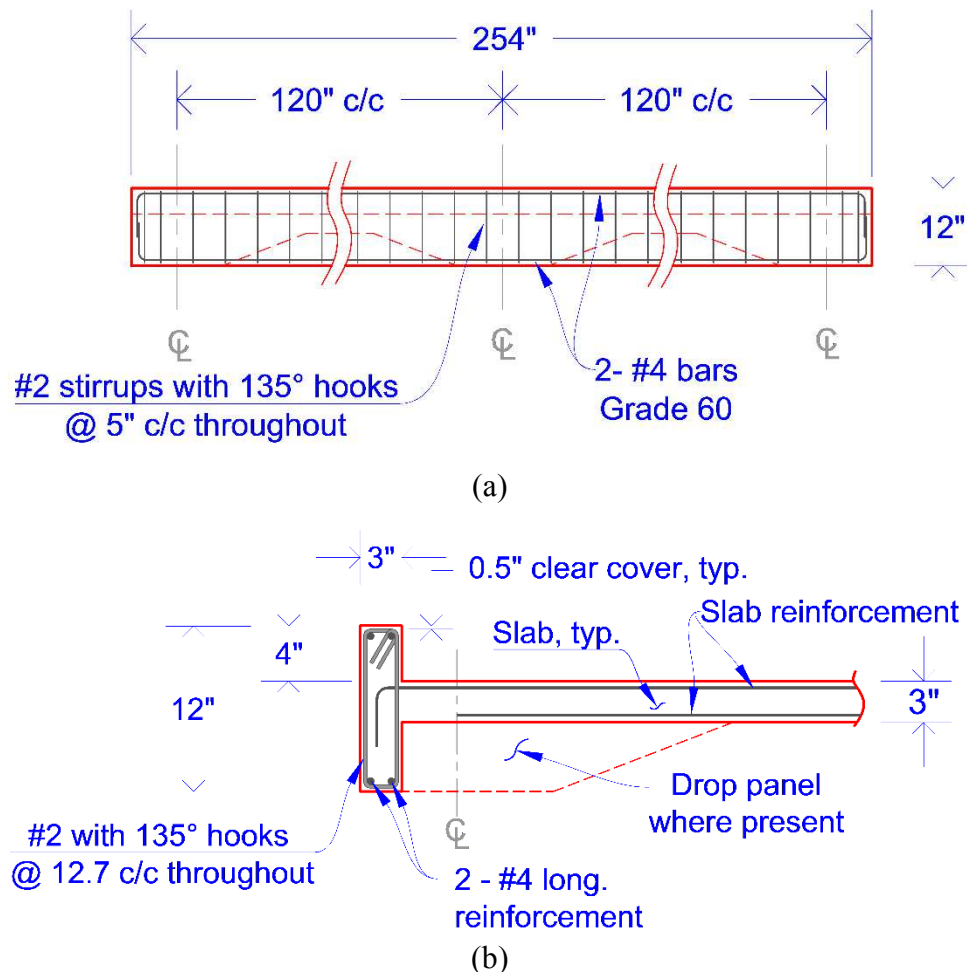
Schematic of beam reinforcement of specimen 2, (a) profile view of the beam reinforcement, and (b) cross-section view of the spandrel beam showing detailing along the length of the beam.
